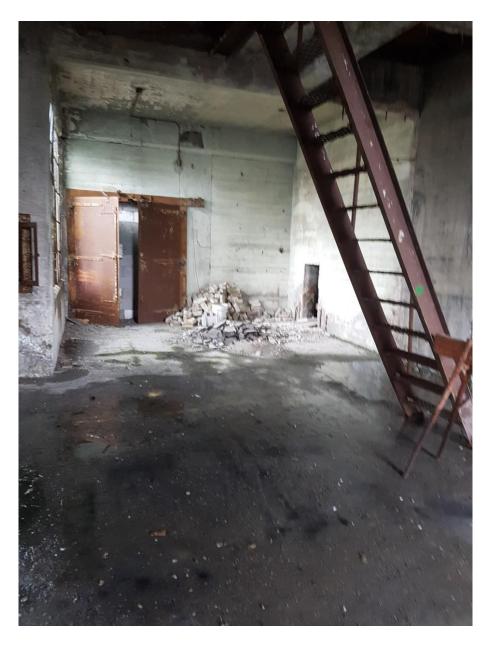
Severe Concrete Floor and Wall Cracks
